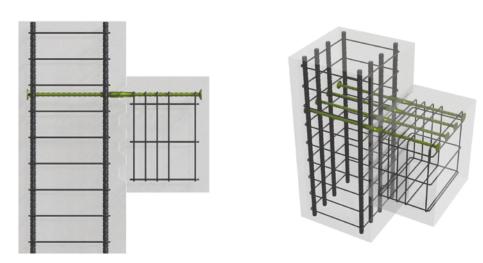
Console reinforcement with STUDIX® Headed connectors according to the calculation example.
